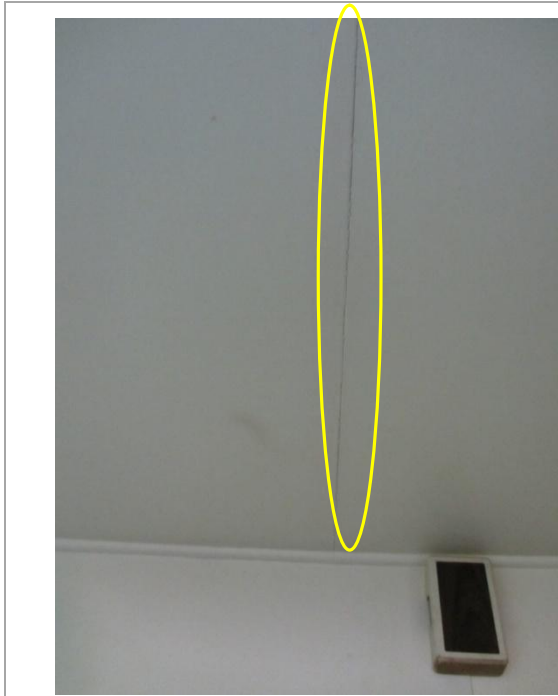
Hairline Cracking along Ceiling Lining Joint
